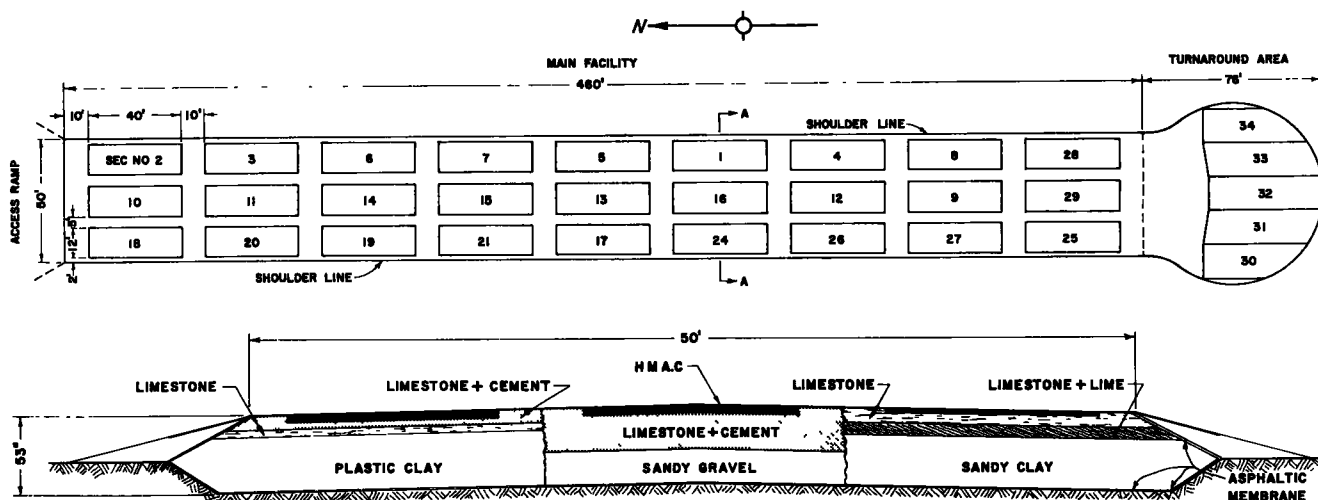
Plan and cross section of TTI Pavement Test Facility.
